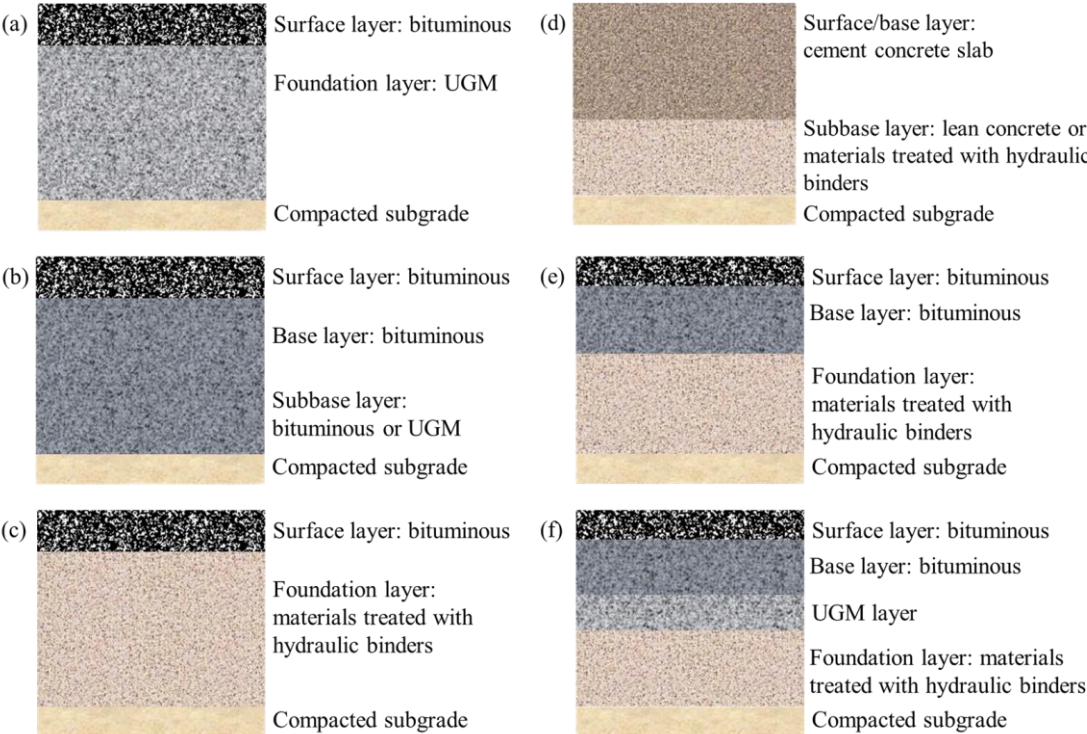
Pavement structure categories in France: (a) Flexible pavements; (b) Bituminous pavements; (c) Semi-rigid pavements; (d) Rigid pavements; (e) Pavement with mixed structure; (f) Pavements with inverse structure.
